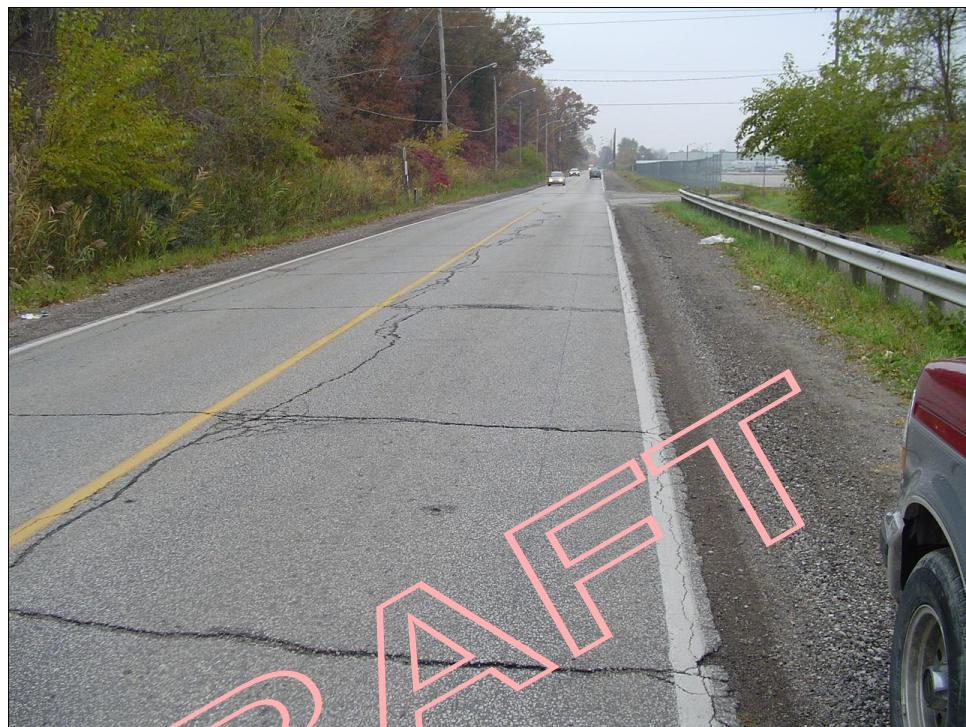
Marden Road - north of E.C. Row Expressway - looking north
